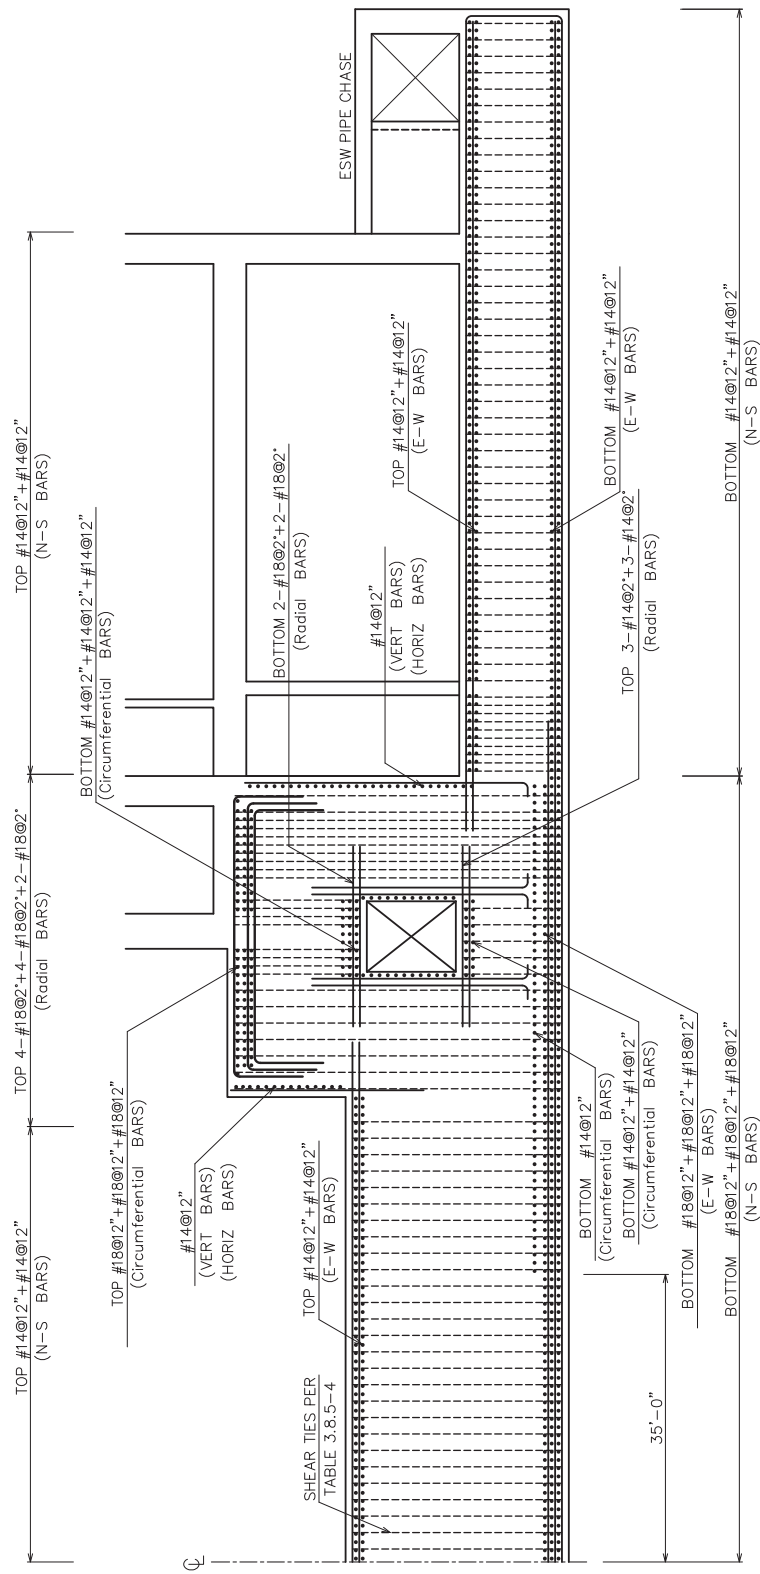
Reinforcing Steel of Basemat: SECTION N-S
